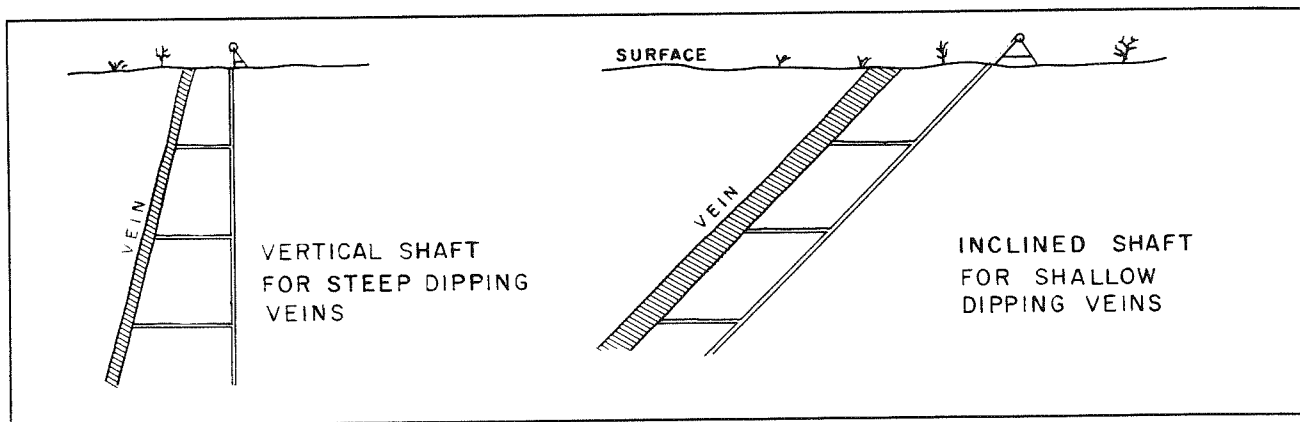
Sketch showing vertical and inclined shaft layouts.
